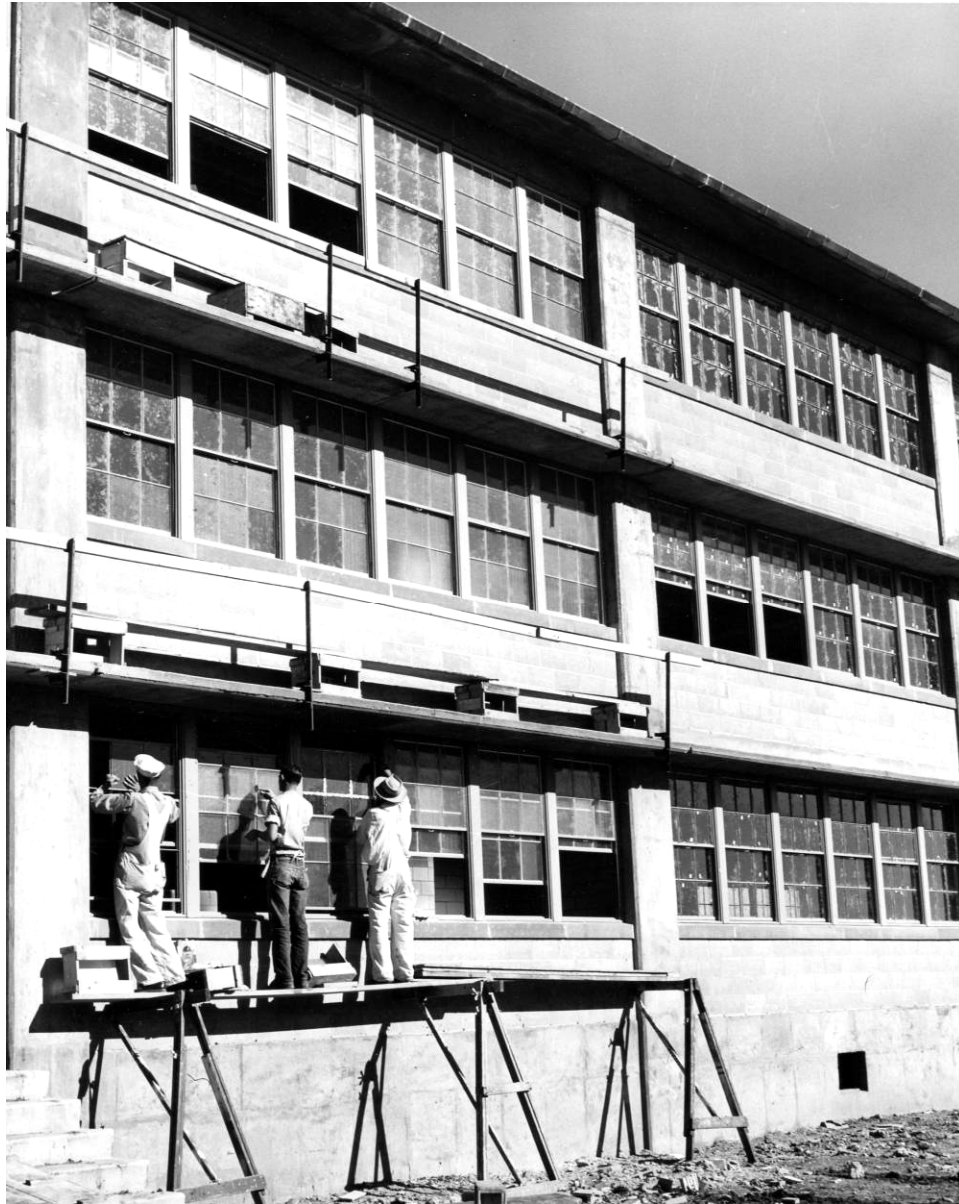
Barracks construction at Custer Hill, 1955 (Museum Division, Fort Riley).
